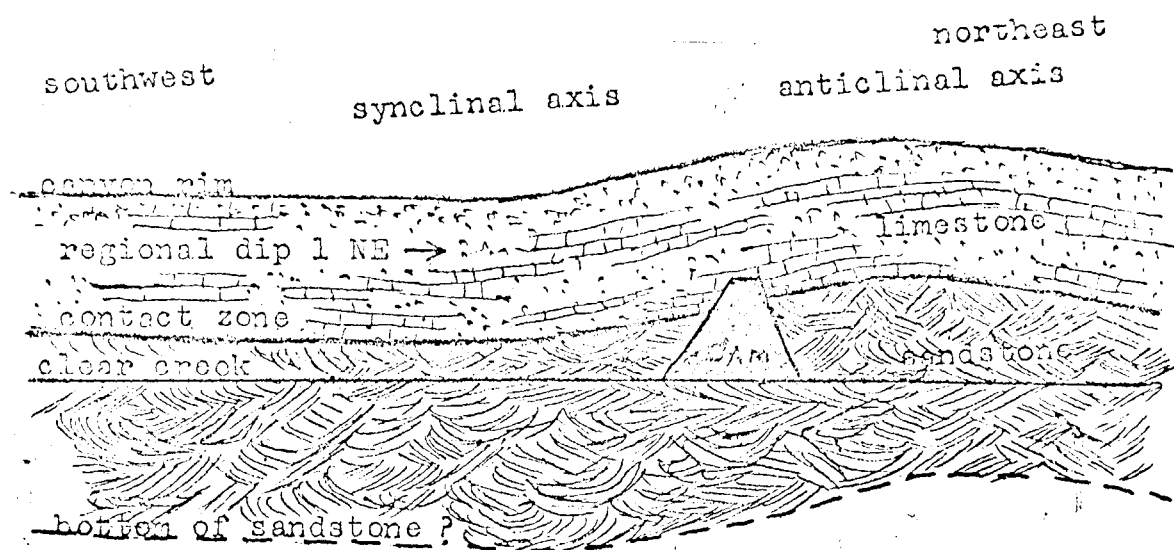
Cross section A-A southwest to northeast through anticline and syncline showing position of dam in relation to the structures. Not to scale.
